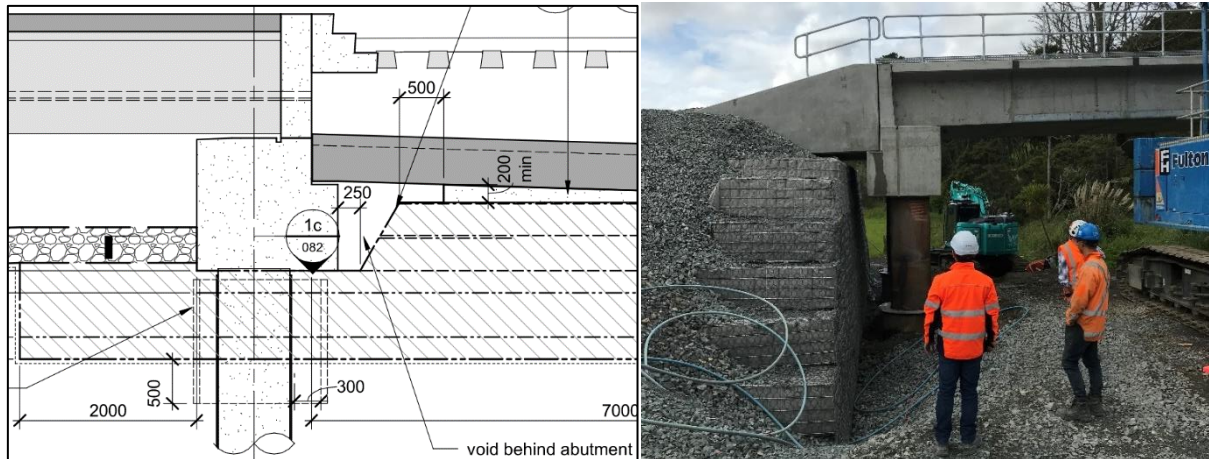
Approach setbacks, left – typical across bridges, right - Bridge 100 NAL
